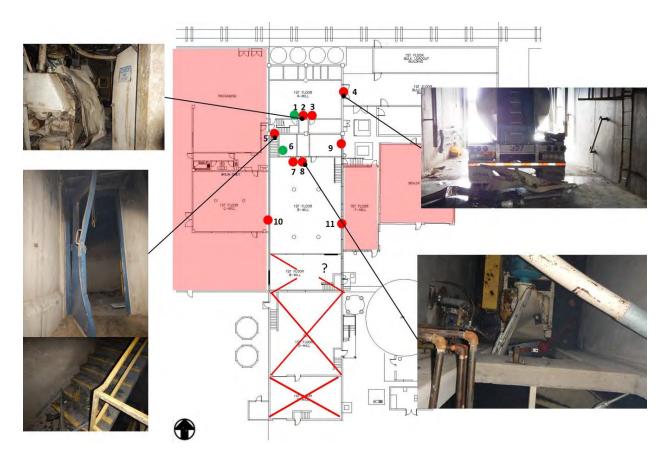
Mill A and Mill B Level 1 Exemplar Blast Indicators
